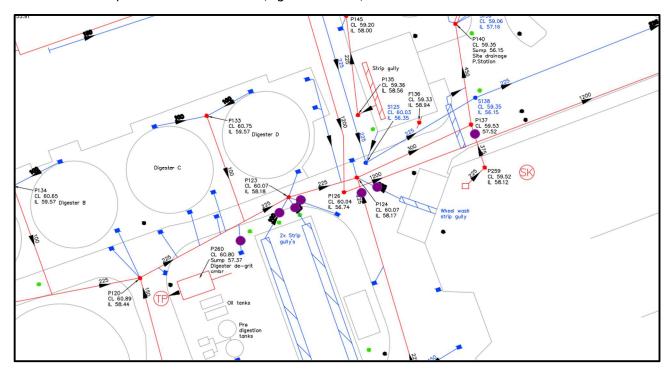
Site drainage outfall pipes into head of the works that require isolation.
